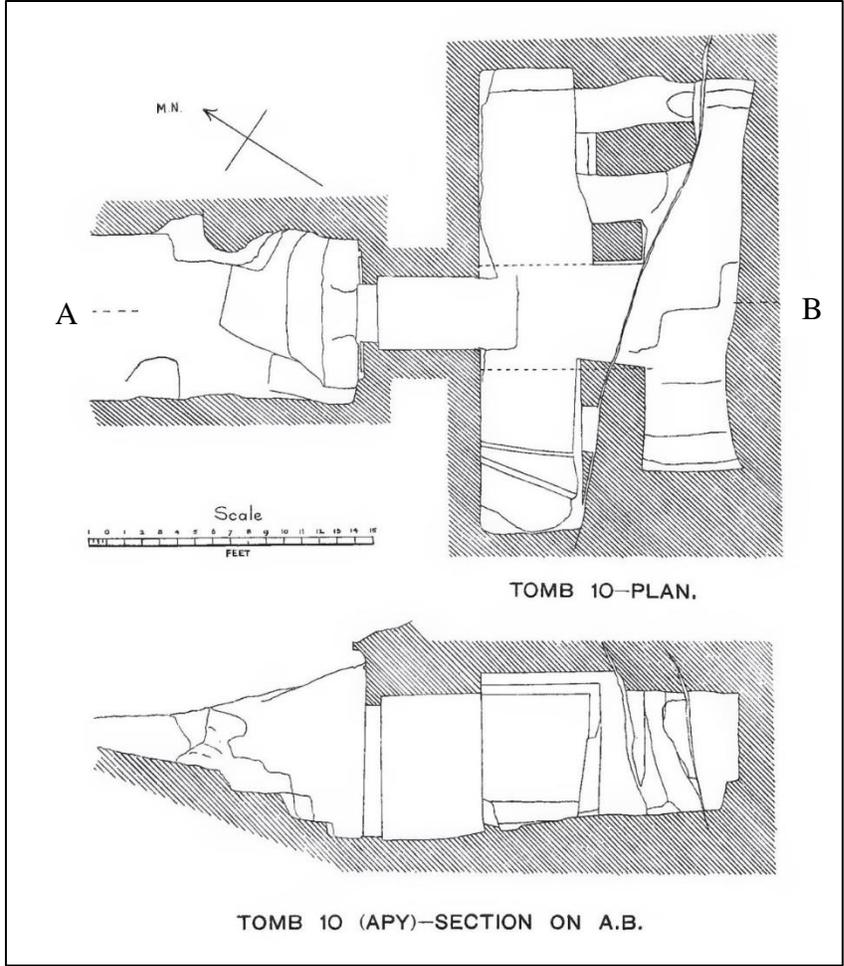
Plan and section of Tomb of Ipy, TA10 [13]
